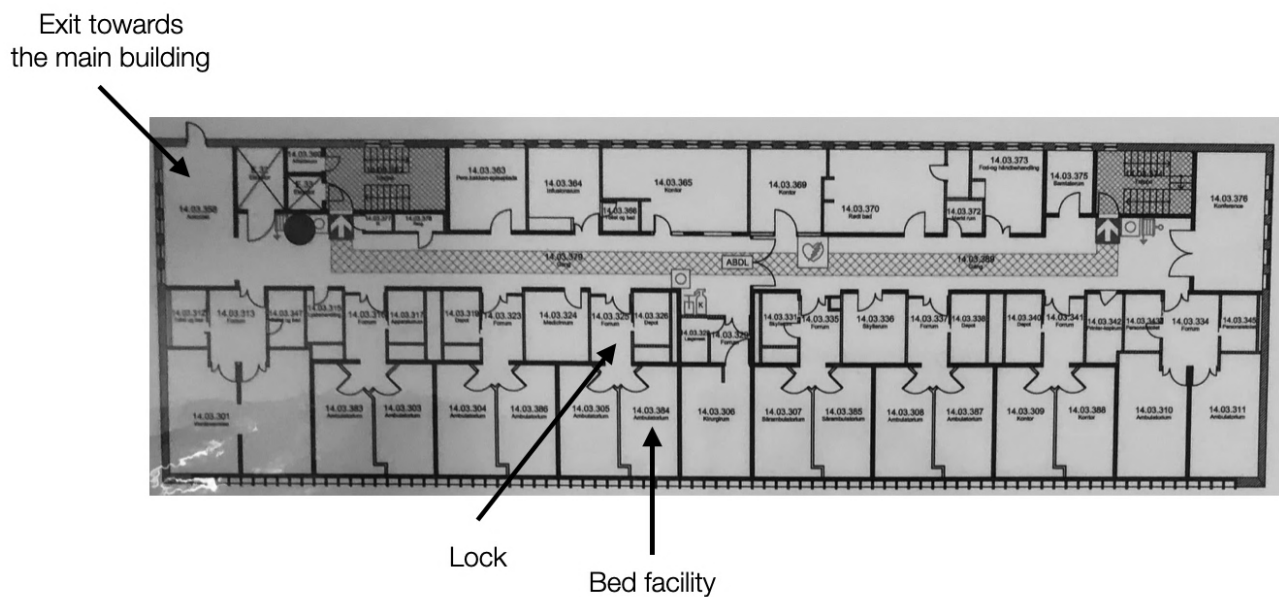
Floor plan of the first floor intended for intensive care patients at the Pandemic Department
